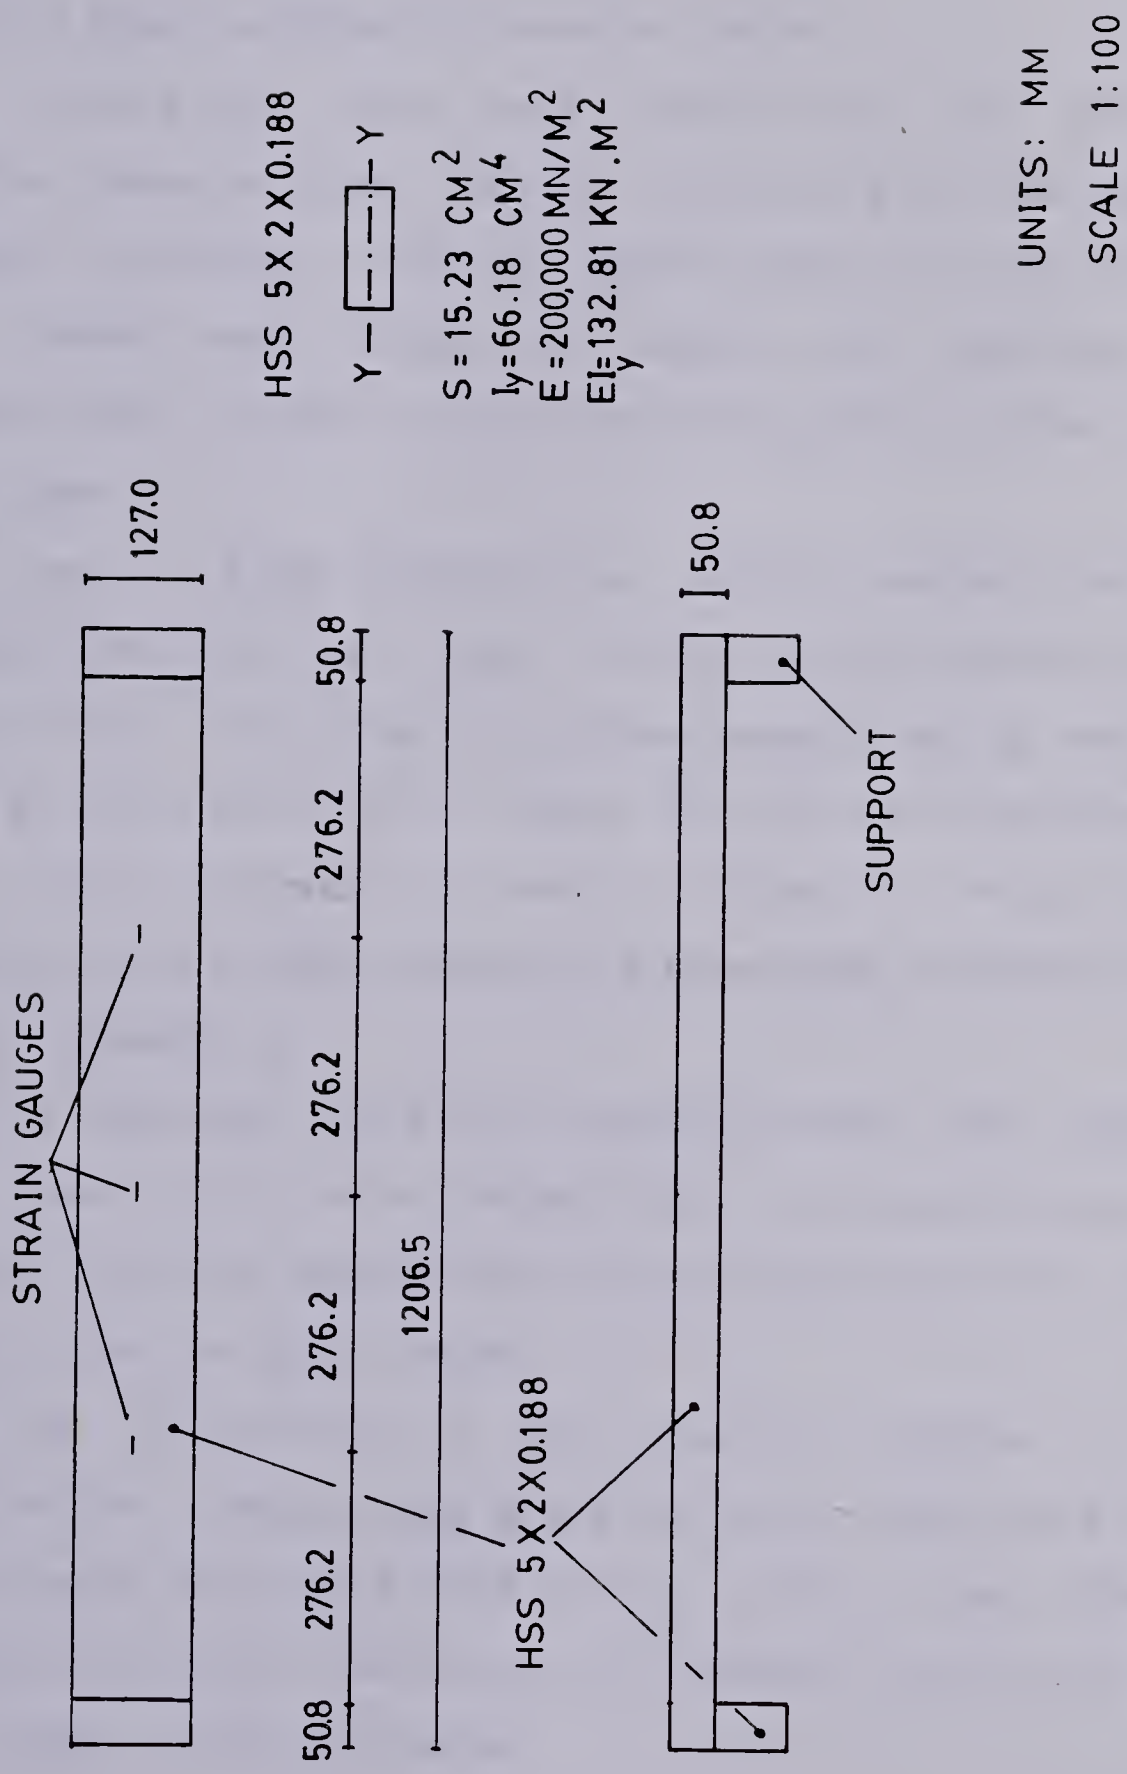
STEEL LAGGING DESIGN DETAILS
